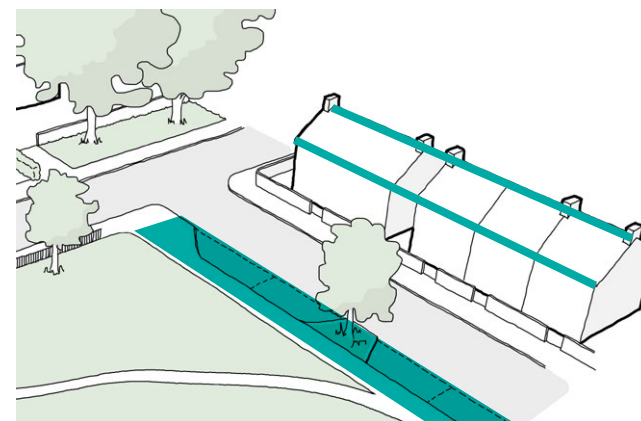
Building lines must be consistent and should face the street where possible. On-street must be incorporated in to the footway.
